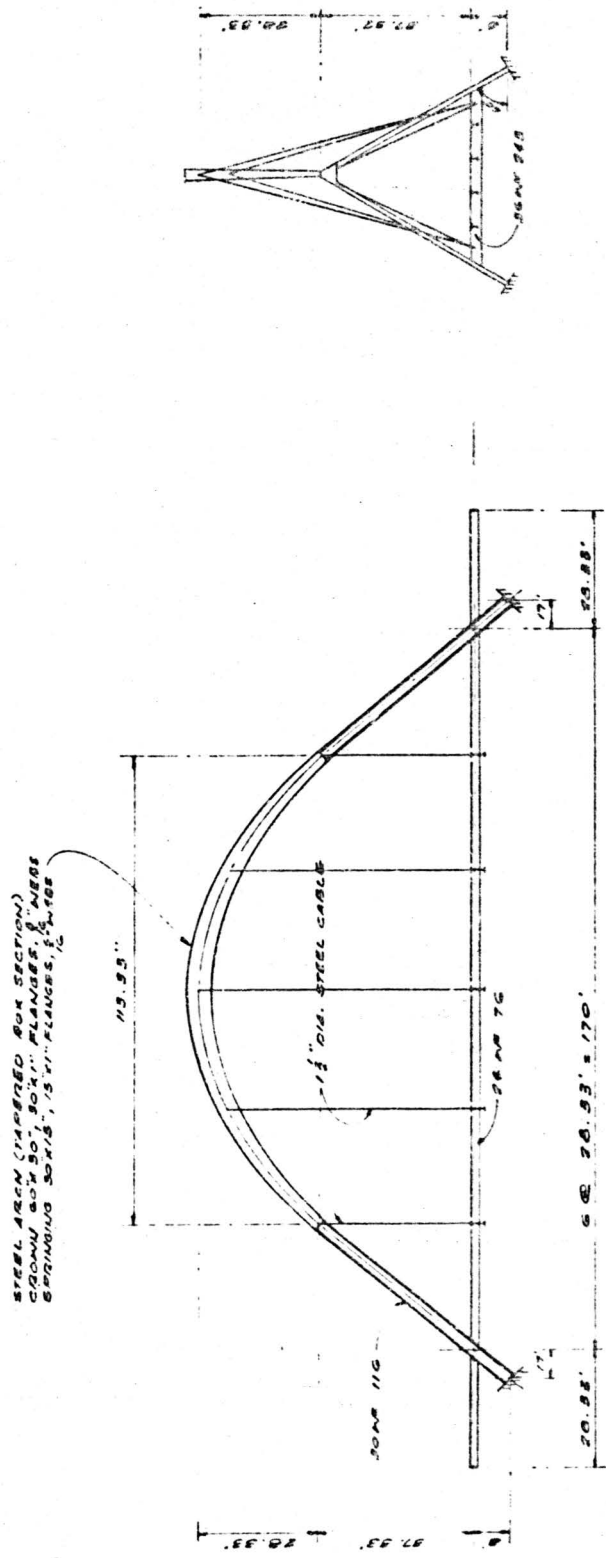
CONCEPT DESIGN SKETCH OF BRACED ARCH BRIDGE
